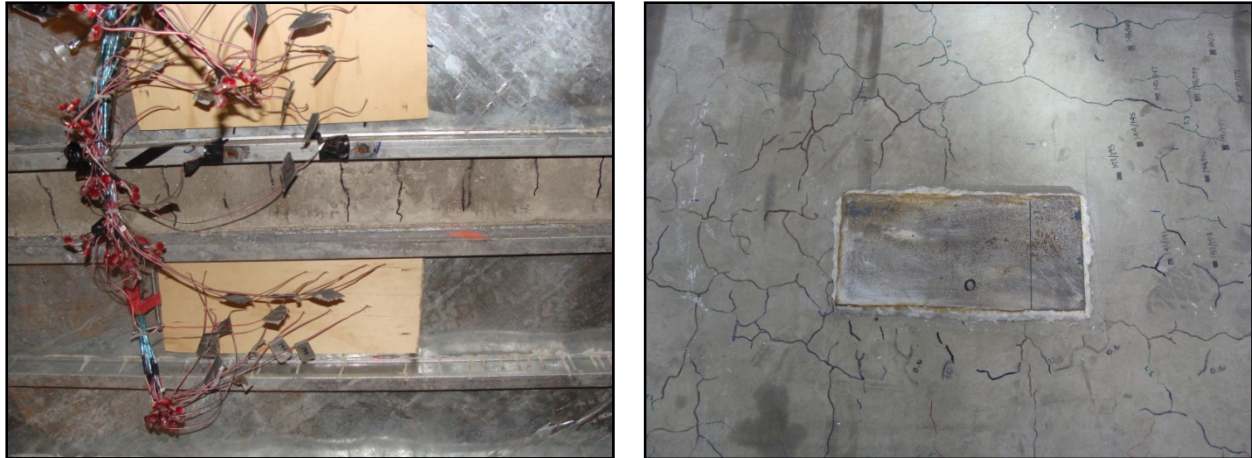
(Left) bottom of transverse splice; (right) transverse splice load patch (note steel plate is still in place)
